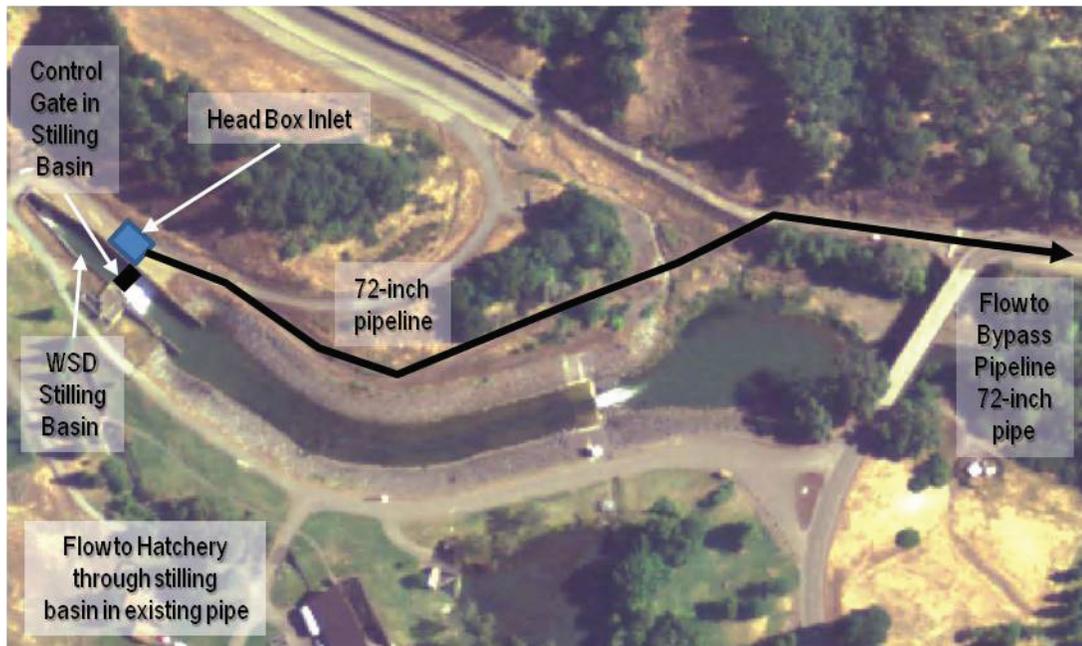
Central Route Inlet Facility - Head Box Inlet
